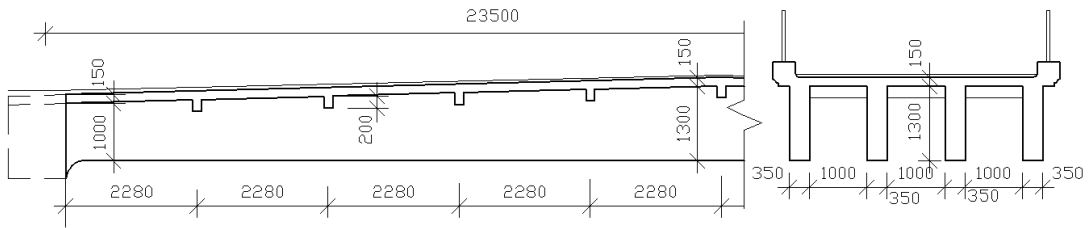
Schematic longitudinal section and cross section in the mid-span of the bridge (dimensions in mm)
